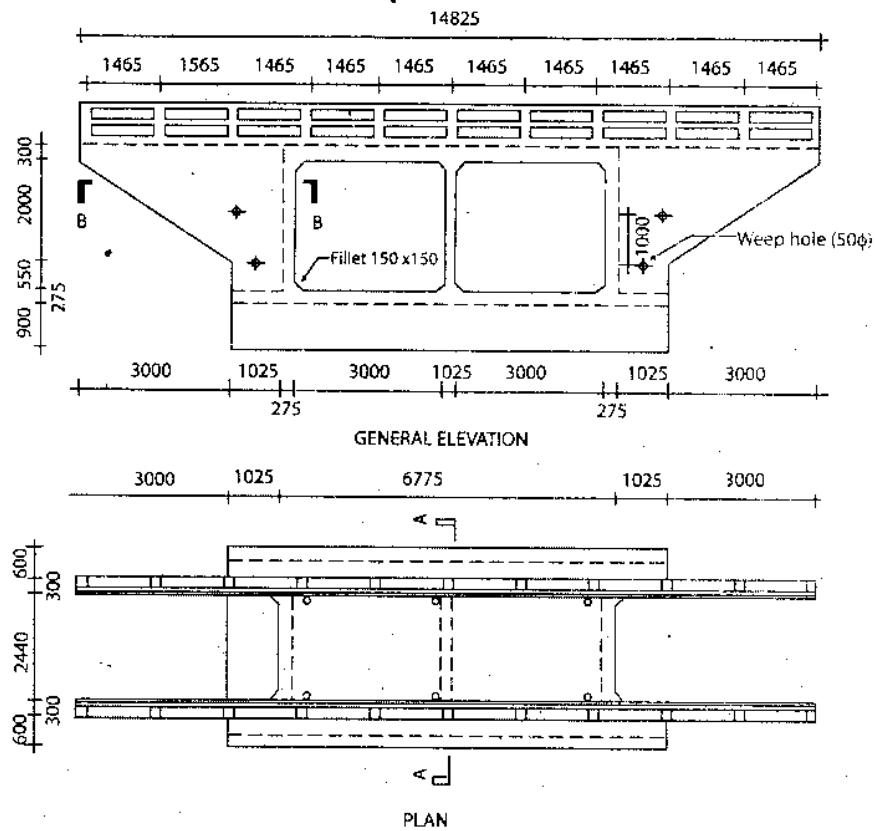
(a) Plan and elevation of a Box culvert double vent 3.0m x 2.6m, Roadway 2.44m
